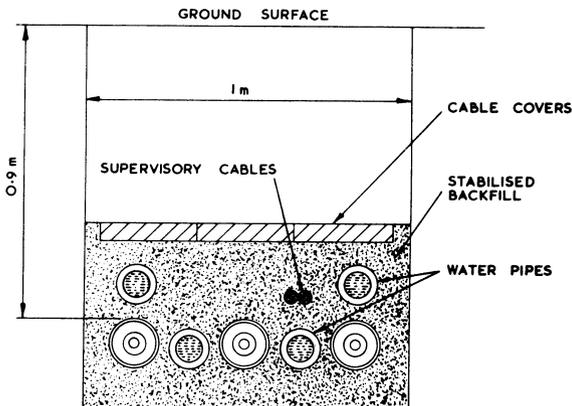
Typical layout of cables and water cooling pipes in a trench
